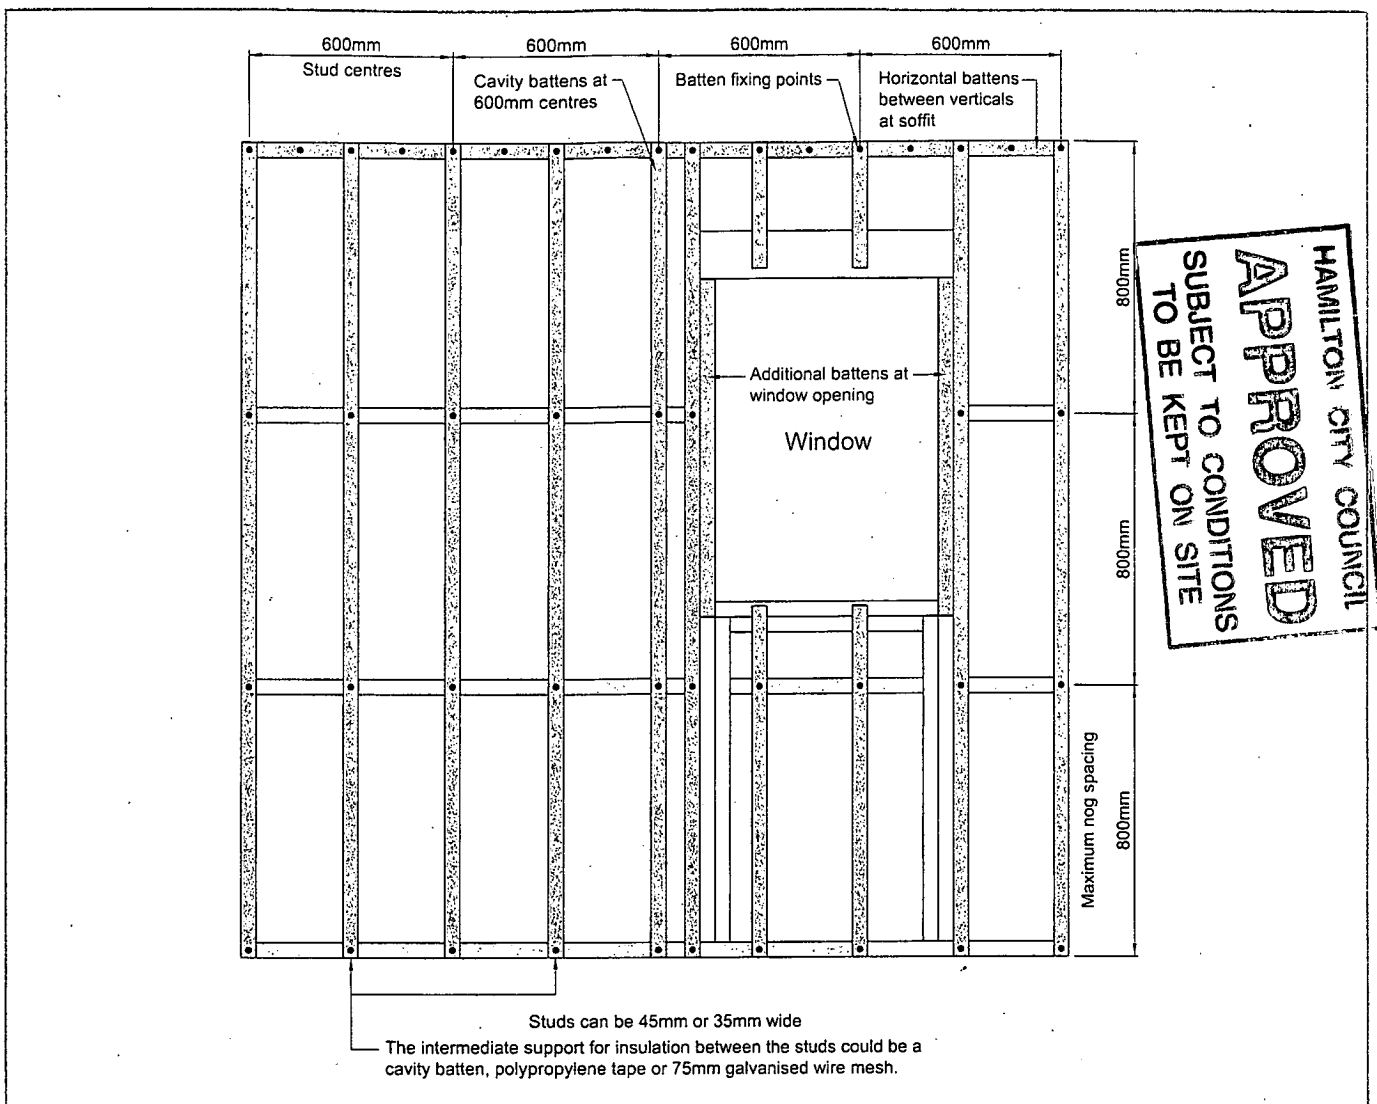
CAVITY BATTEN LAYOUT AT WINDOW OPENING
